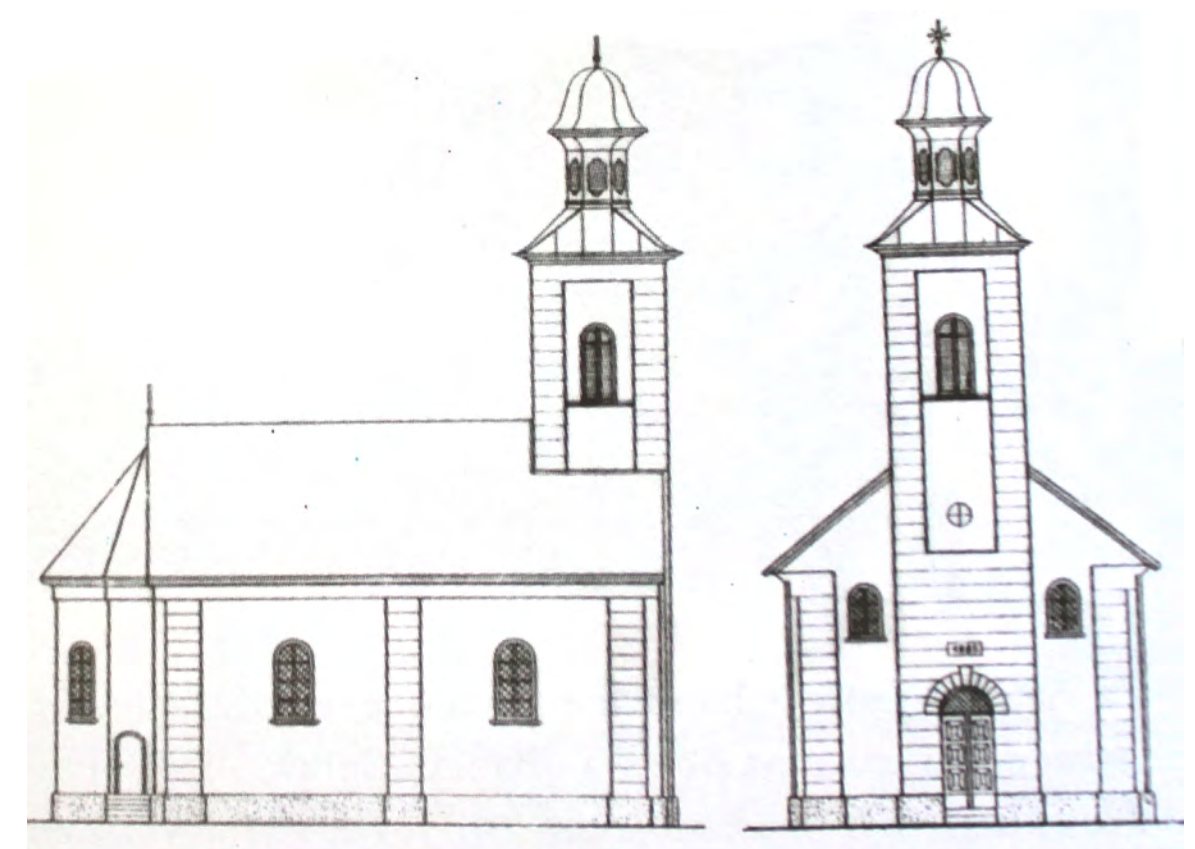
Orthodox church in Rebrovac. Elevation views from north and west.
